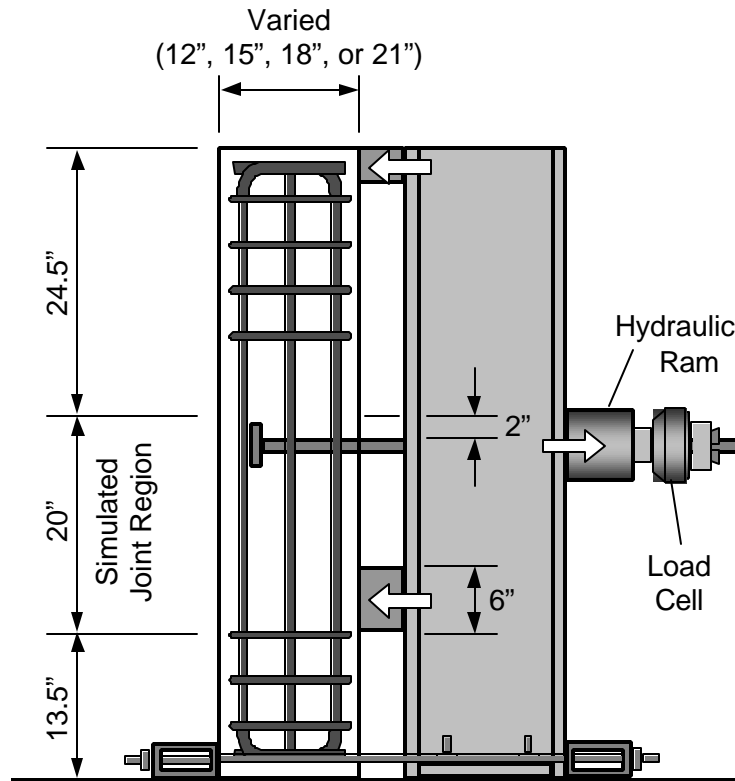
Typical exterior beam-column joint studied by Bashandy
